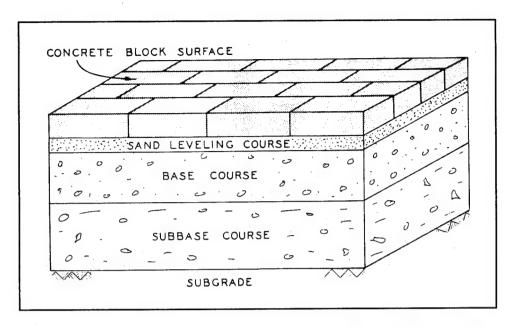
Cross section of typical block pavement (from Anderton 1991a)
